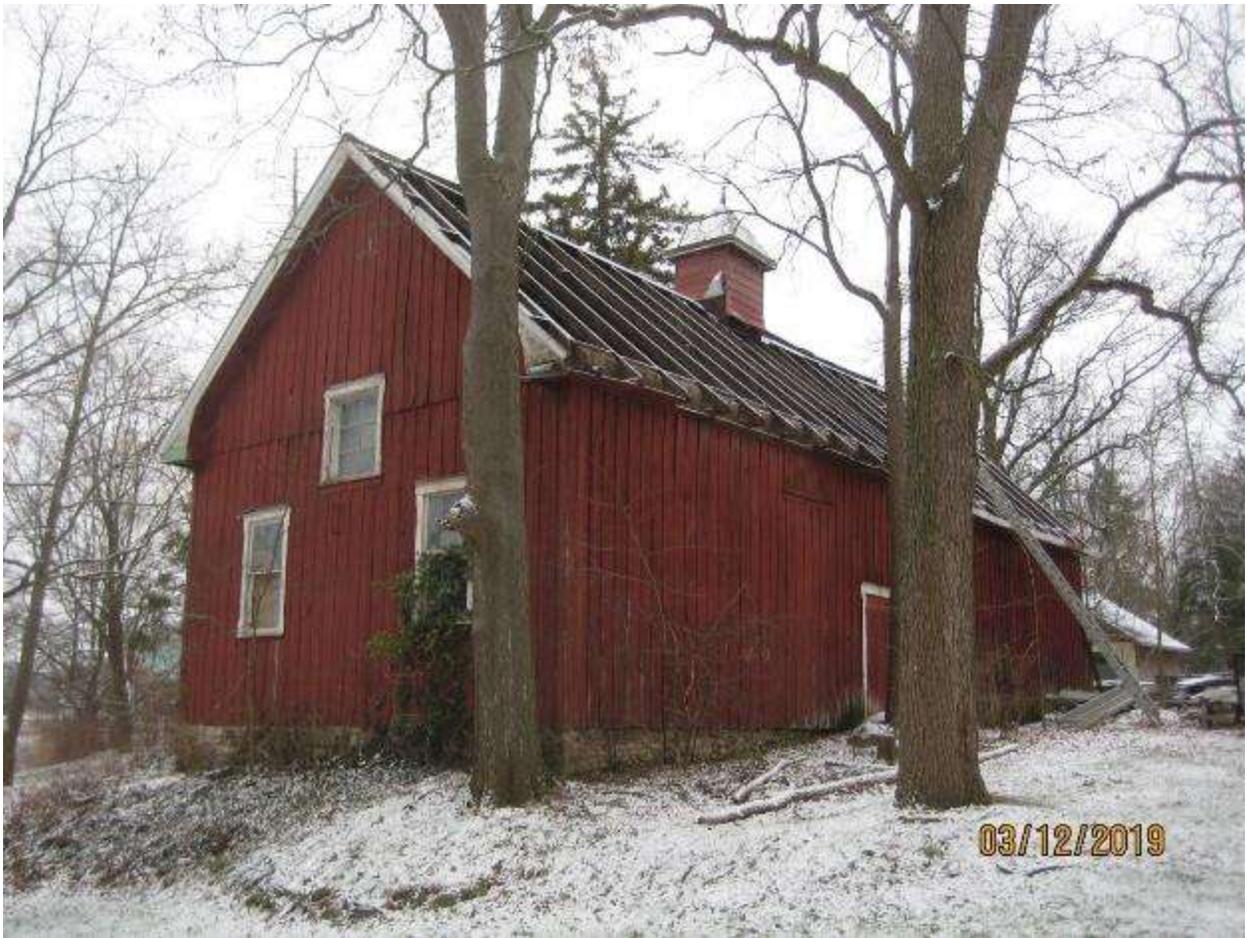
Photograph of the west side of the accessory building, showing the removed roof sheathing, December 3, 2019.
